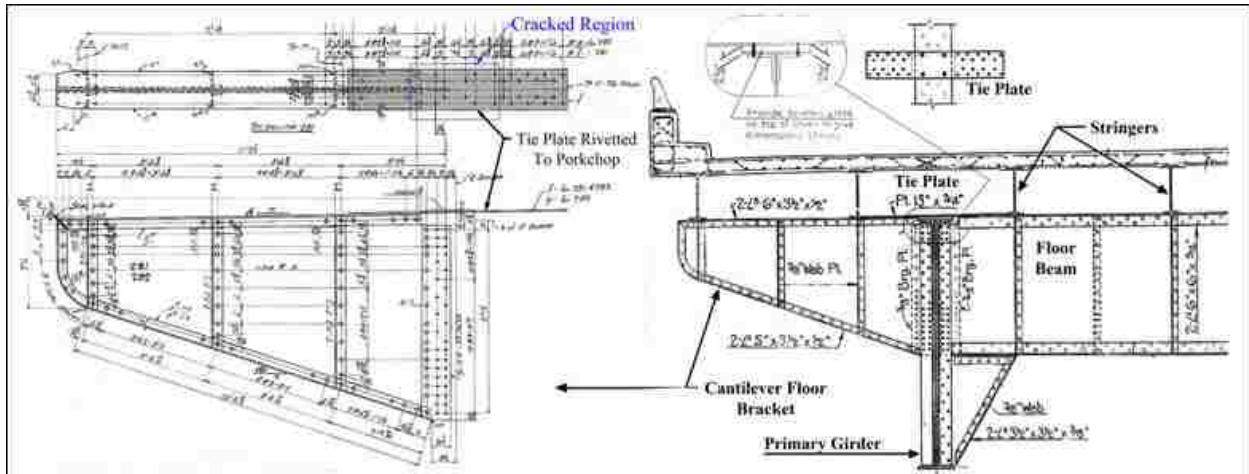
Cantilever bracket to tie plate to floor beam connection details
